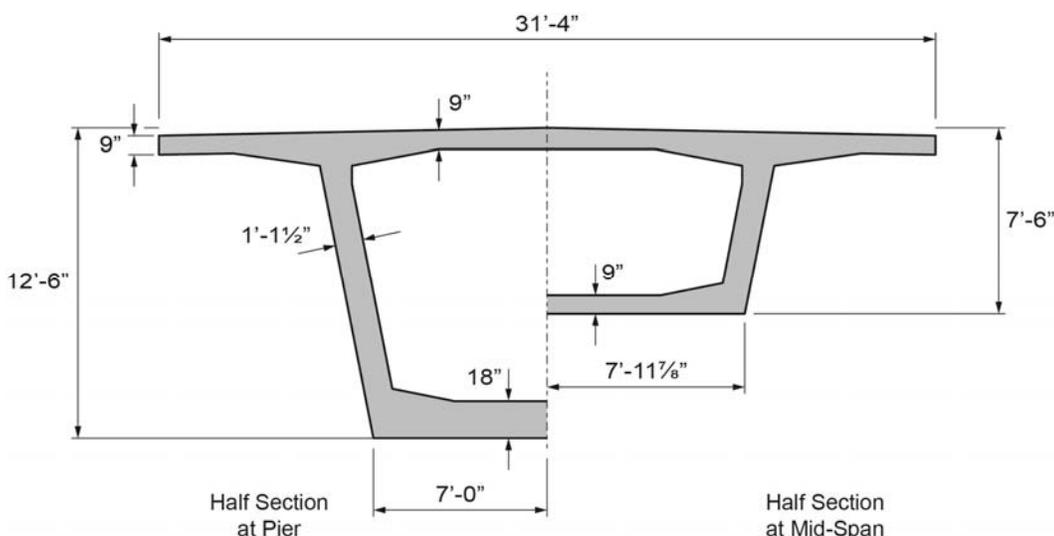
Cross Section for the 250' Span Bridge shown in Alternate 3
